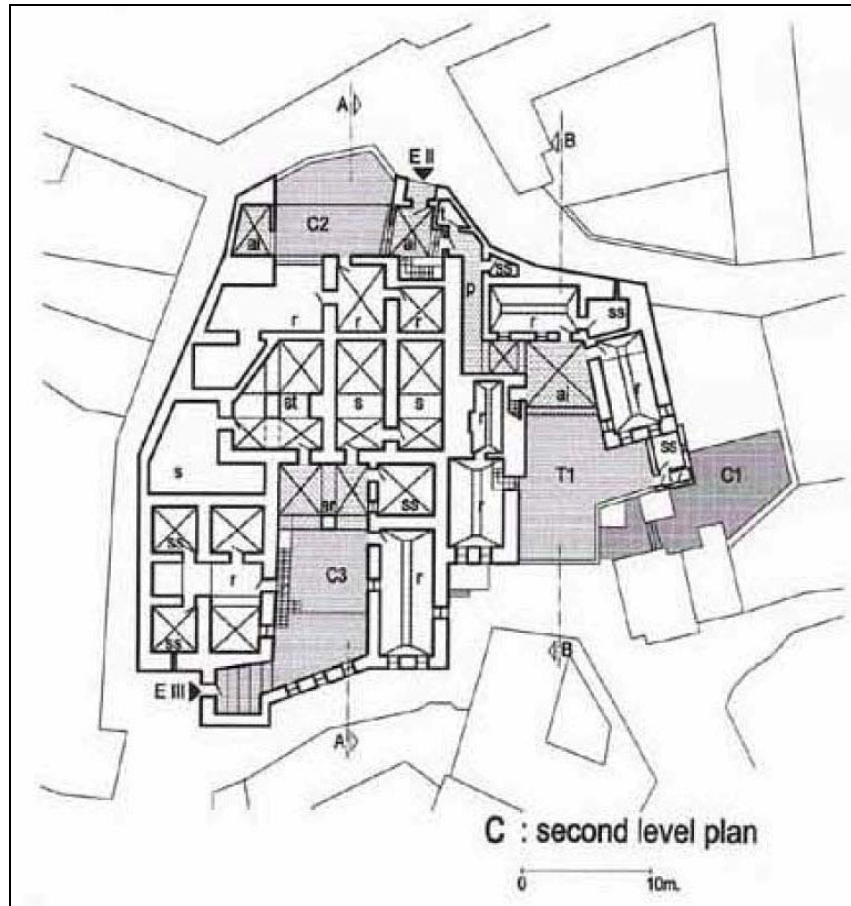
c: Second Level Plan (Alioğlu (2003.132-133))
